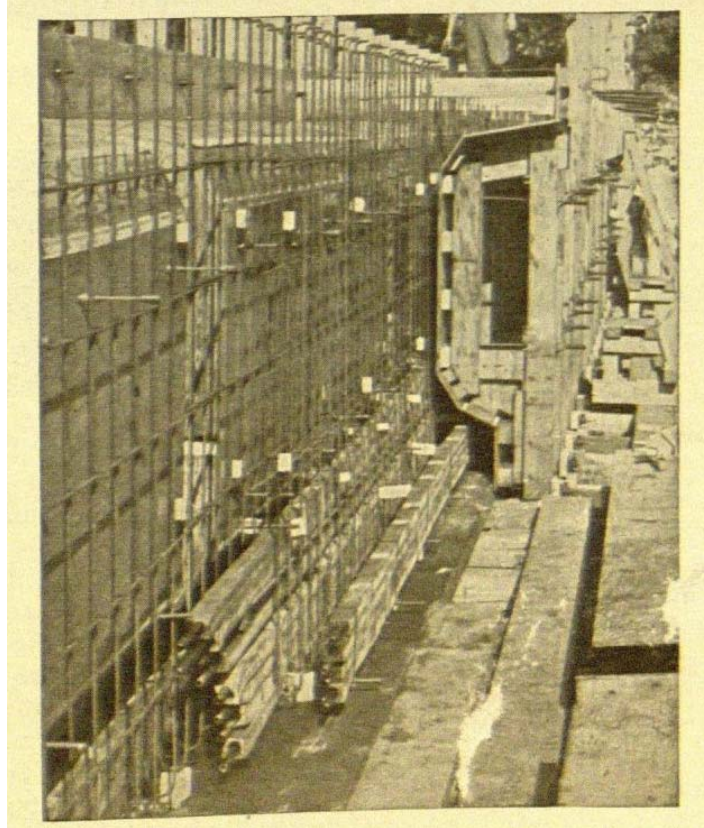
Walnut Lane Bridge: Mild steel reinforcement and rubber sheaths in main-span beam (Magnel 1954).
